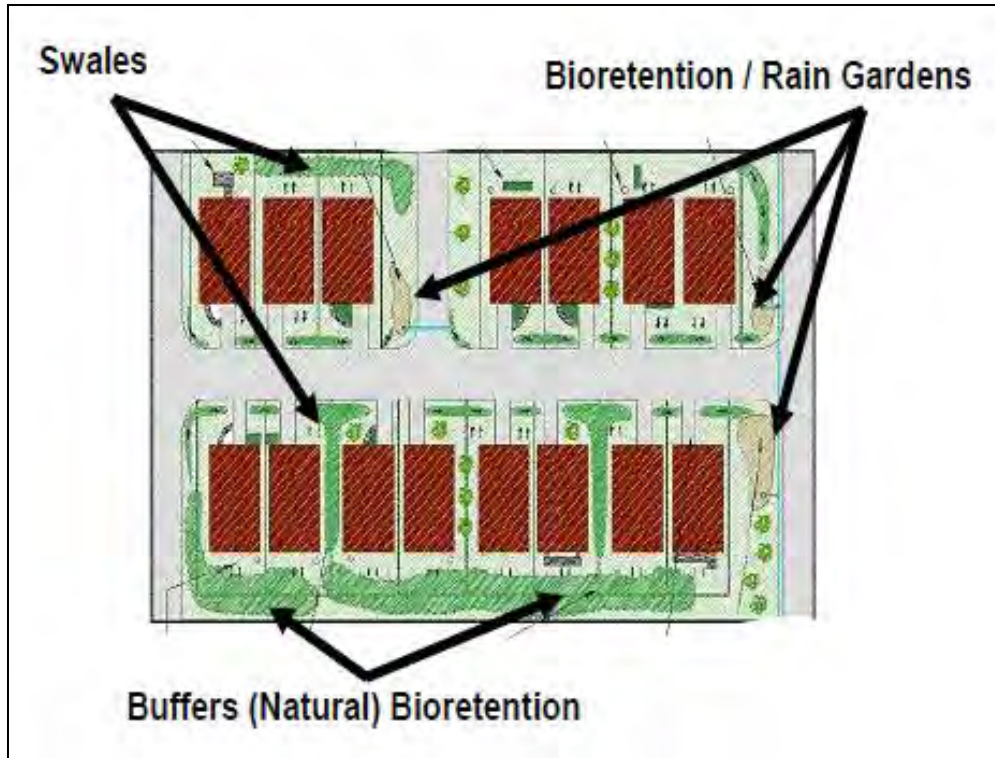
LID Design for a Residential Townhouse Project Constructing LID Projects (New Hanover County & City of Wilmington, 2008)
